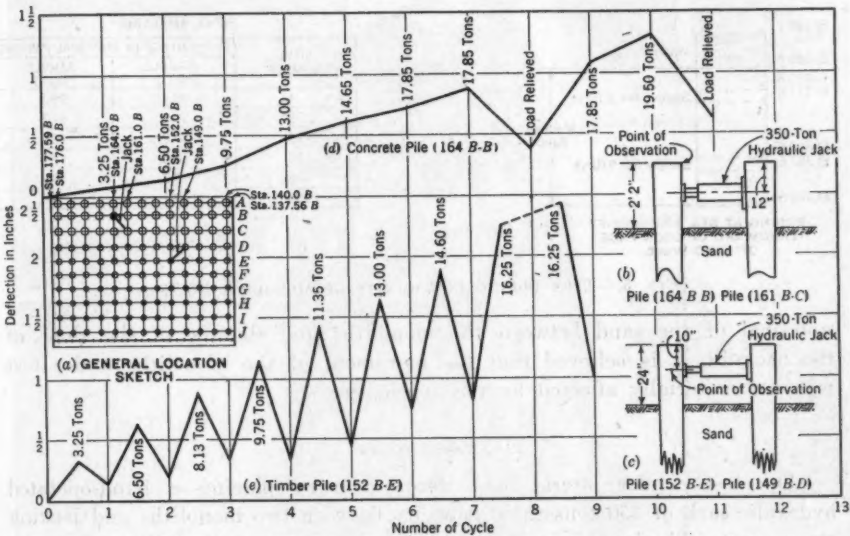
DEFLECTIONS OF A SINGLE CONCRETE PILE.
